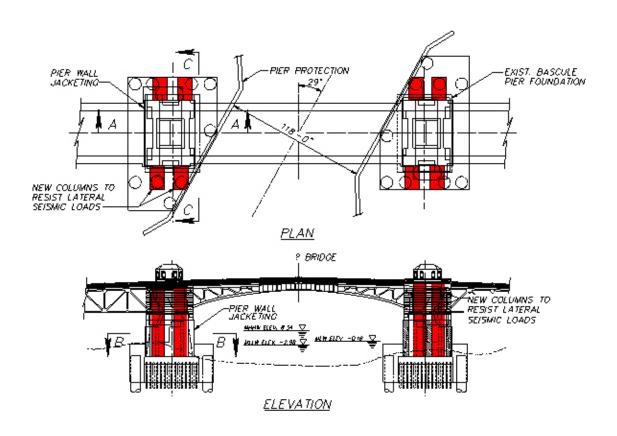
Bascule Pier Wall – Rehabilitation Option 1 (Plan & Elevation)
